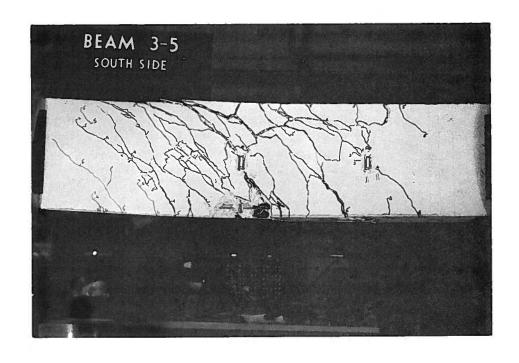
10 CRACK PATTERN OF BEAM 3 - 5
